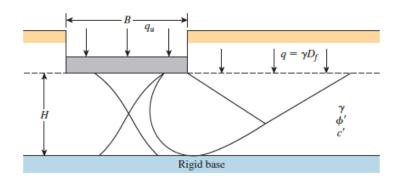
Failure surface under a rough continuous foundation with a rigid rough base located at a shallow depth
